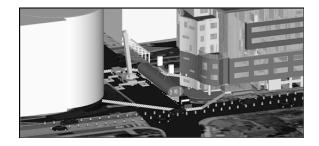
3D view of the logistics plan during the connector bridge offloading phase
